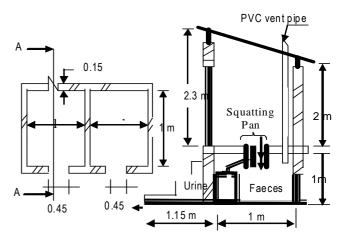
Floor plan and cross section of double vault UDDT (Source: EEPCO, 2008).
